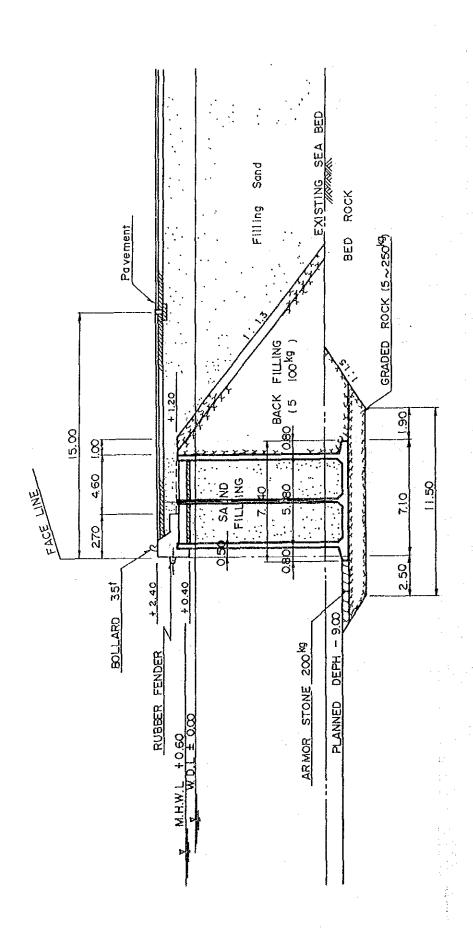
Typical Cross Section of Feeder Berth
